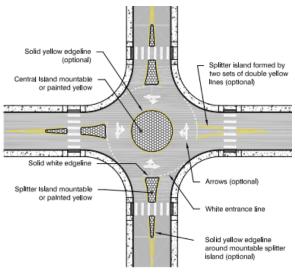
Sample Pavement Marking Plan for a Mini-Roundabout
